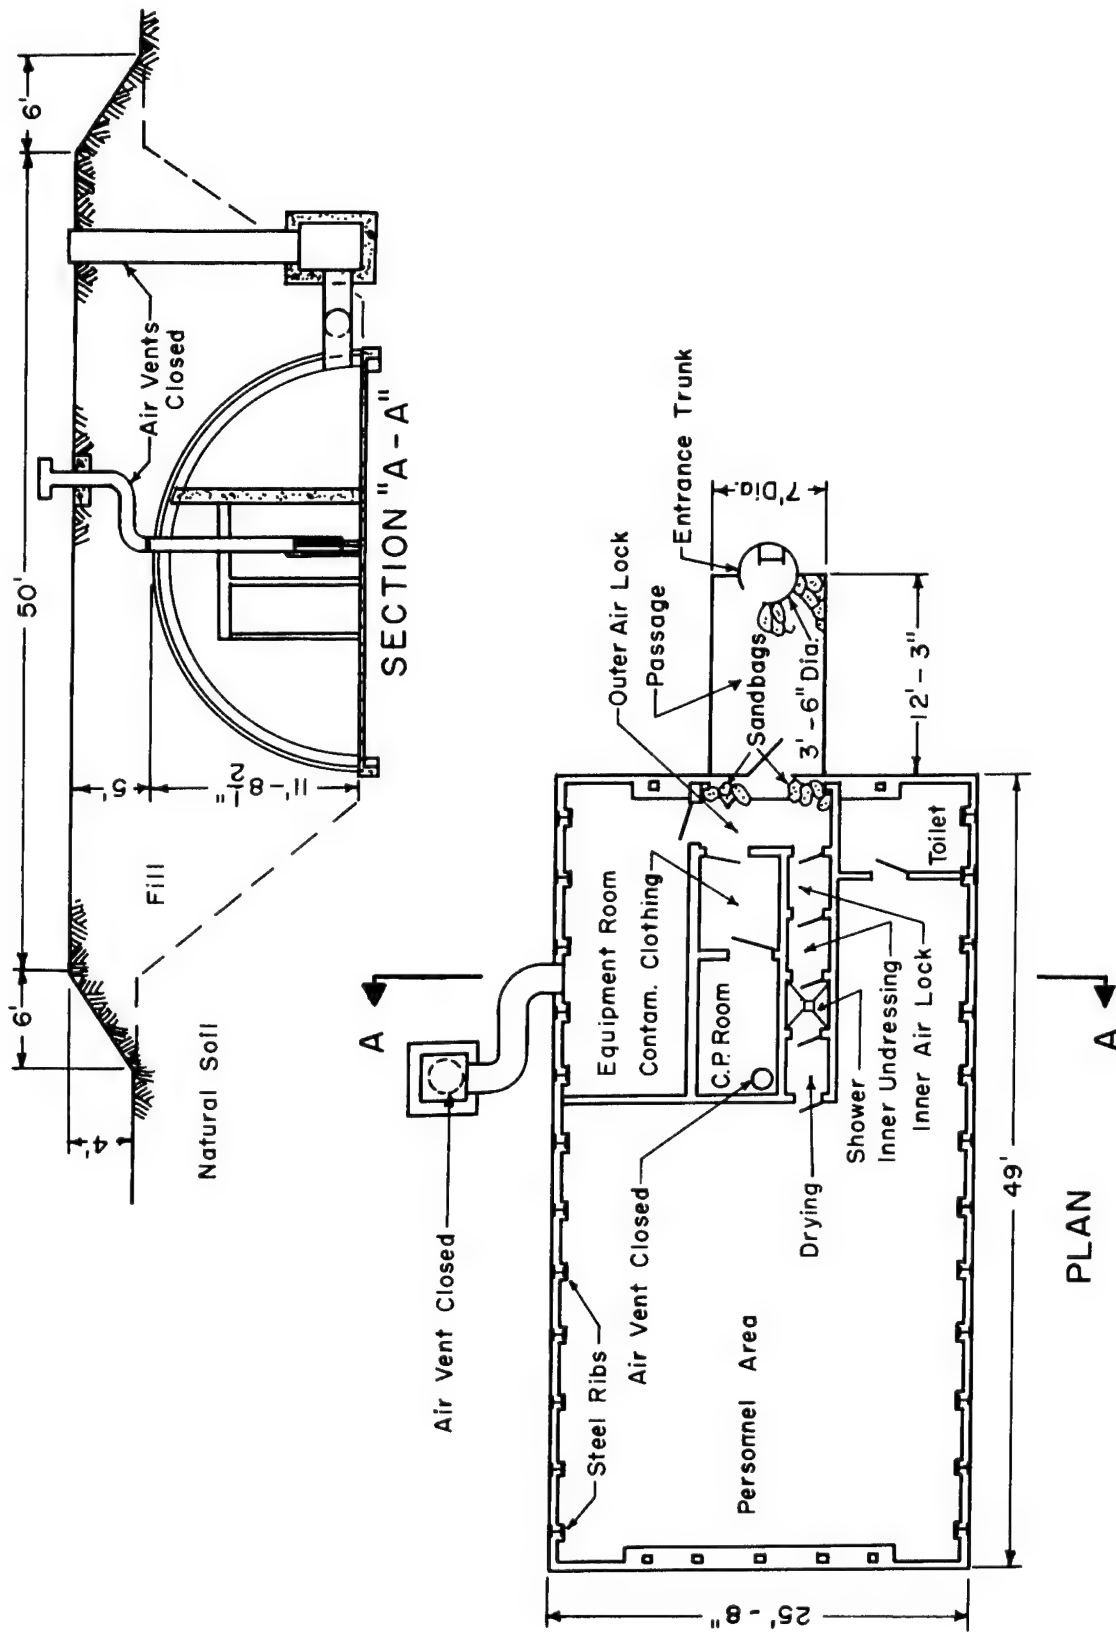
3- Plan and elevation of 3. 3C structures (Priscilla Shot).
